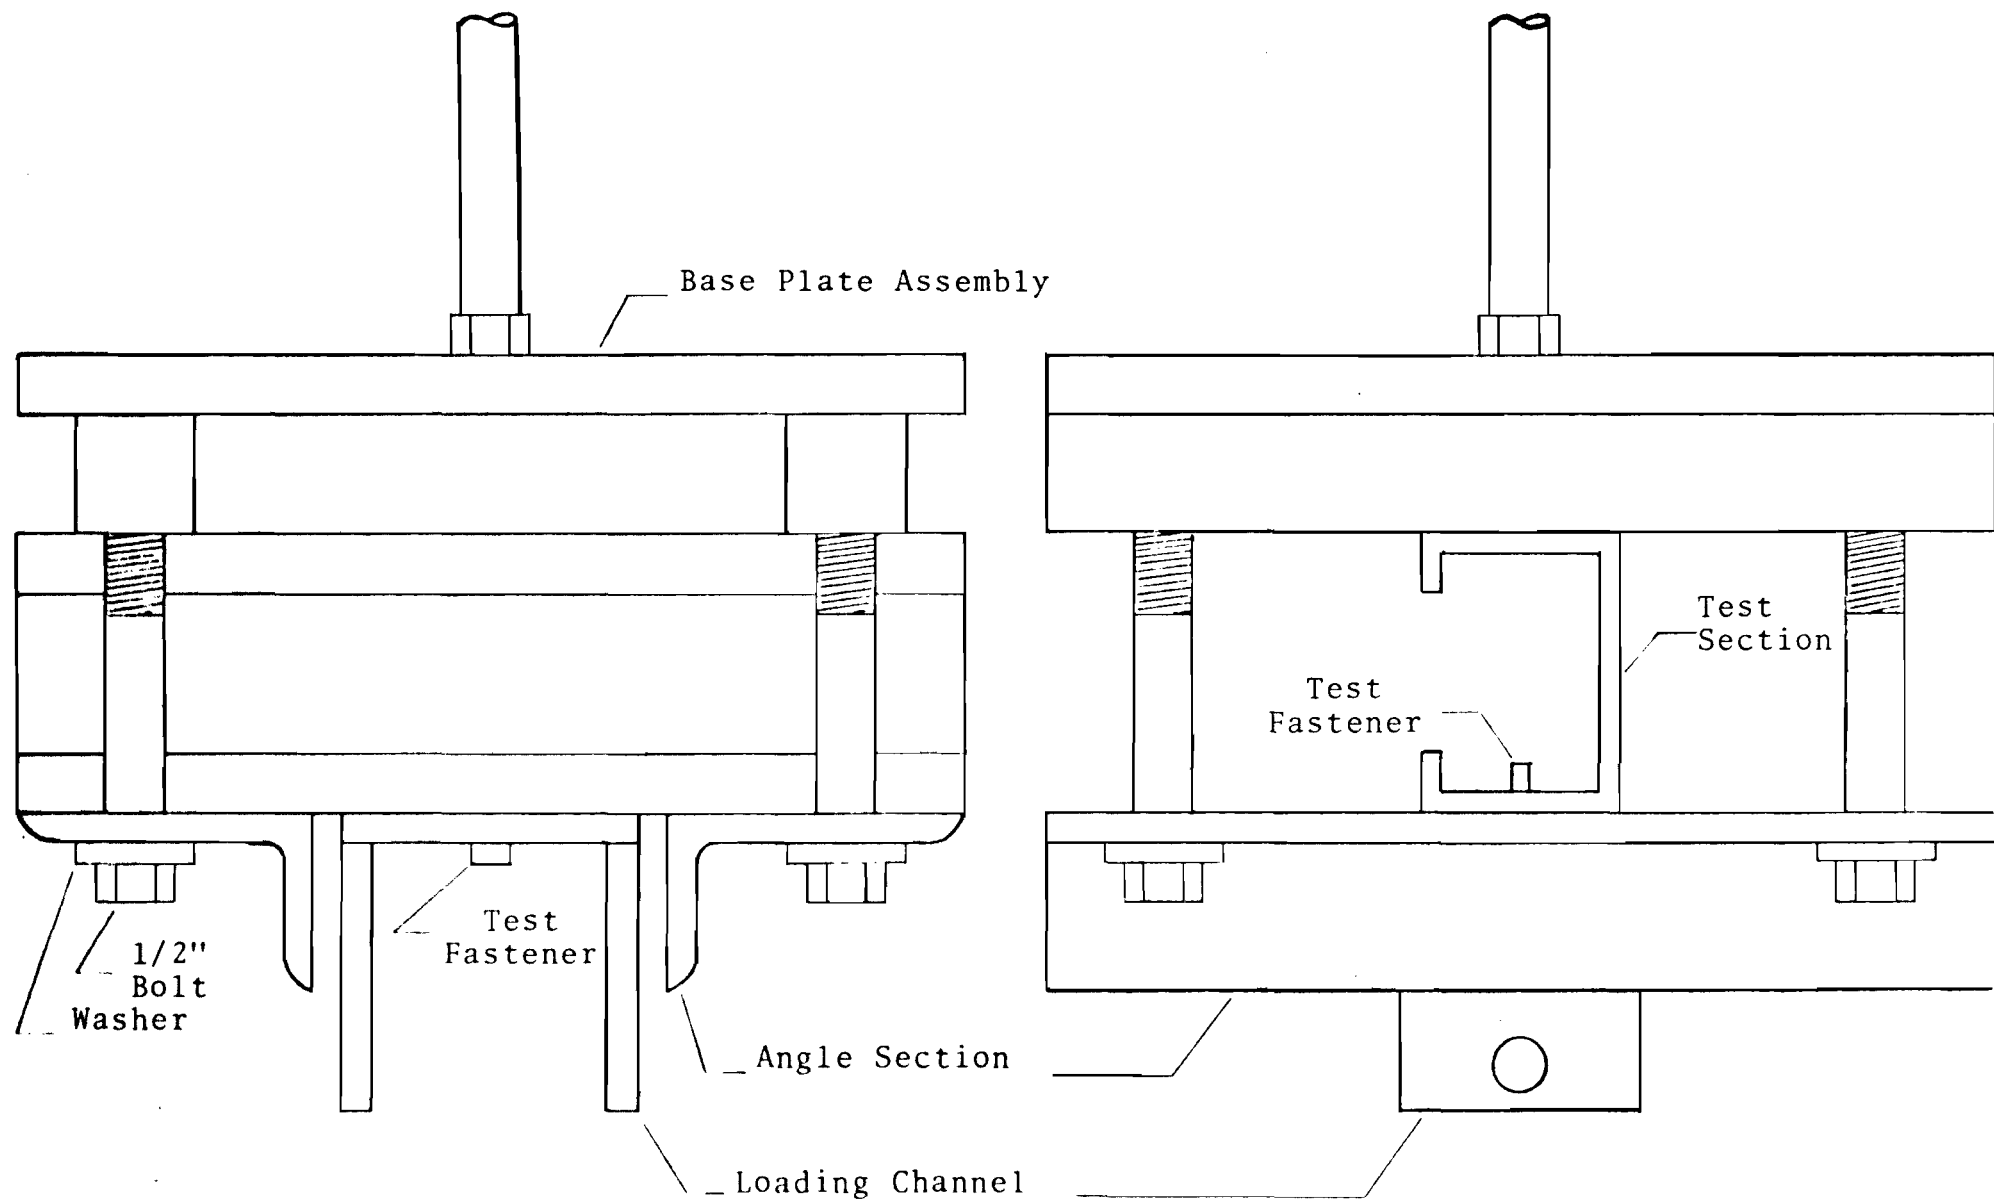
TEST SPECIMEN INSTALLATION FOR UPLIFT TESTS WITH FORMED SECTIONS
